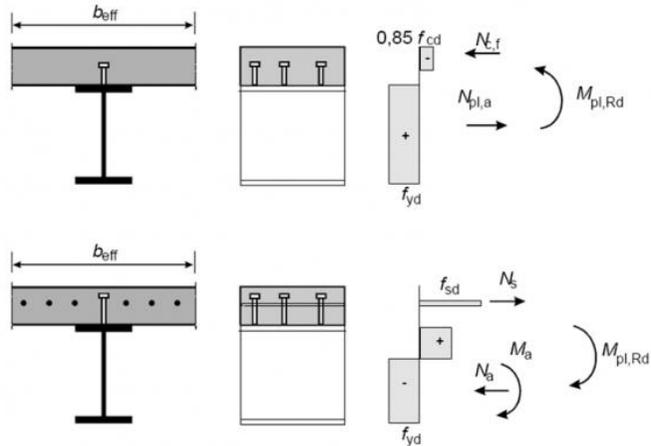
Composite Beam with Shear Connection between Steel Beam and Concrete Slab, with Diagrams of Stress Distribution in Cross Section [68]
